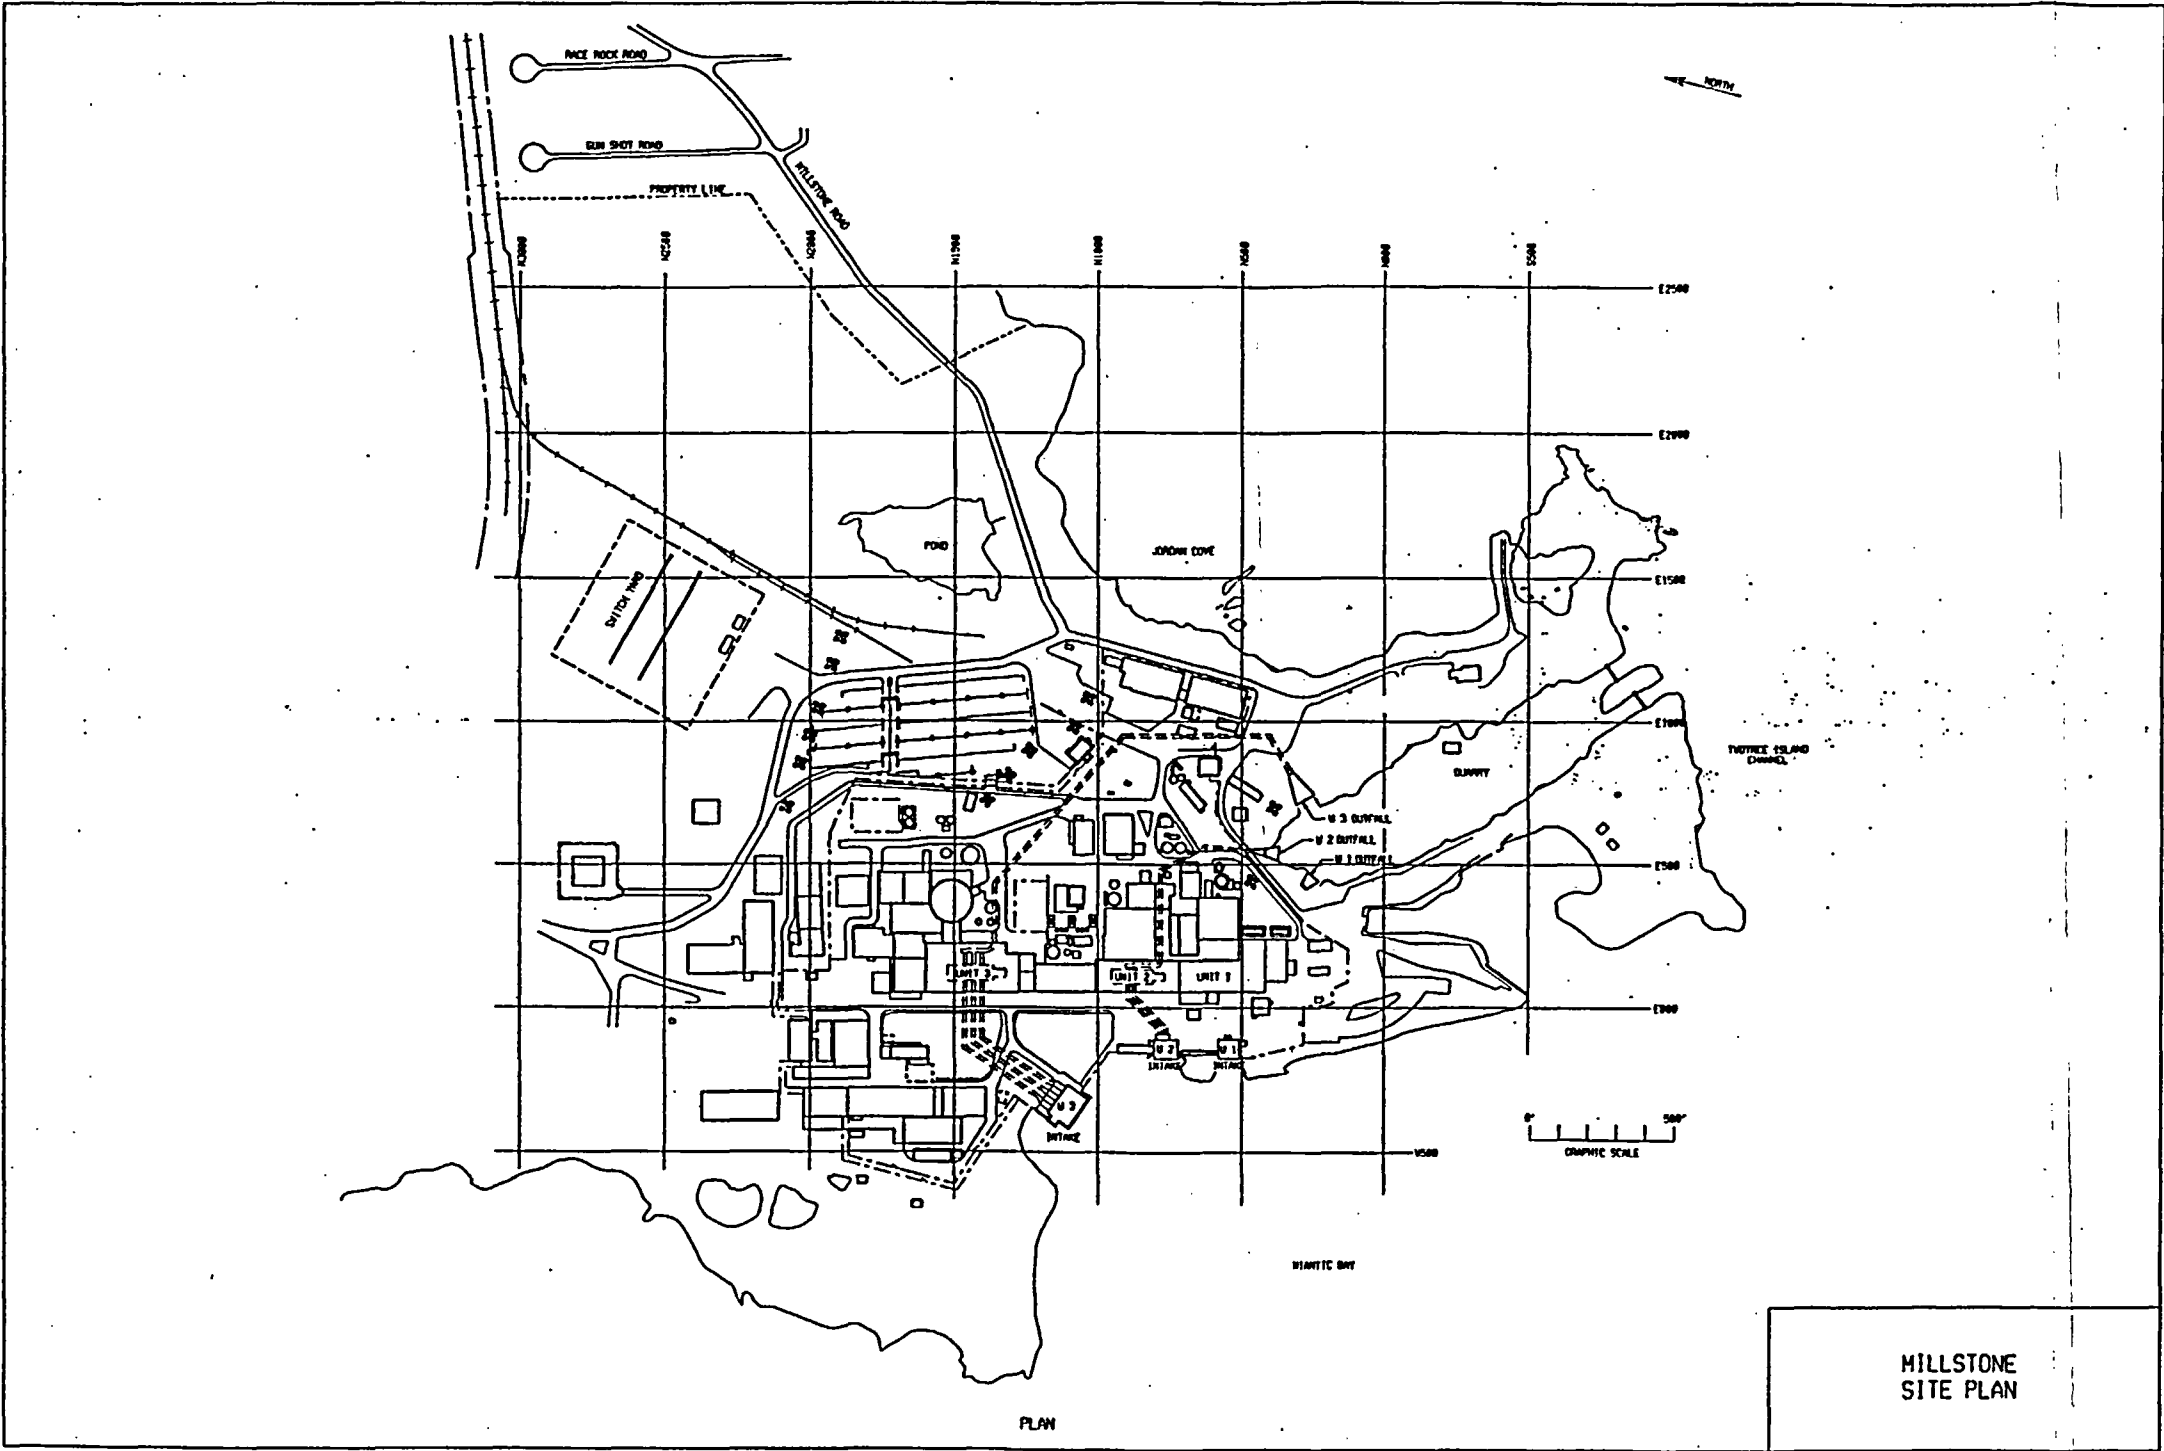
Millstone Units 1, 2, and 3 Site Plan
